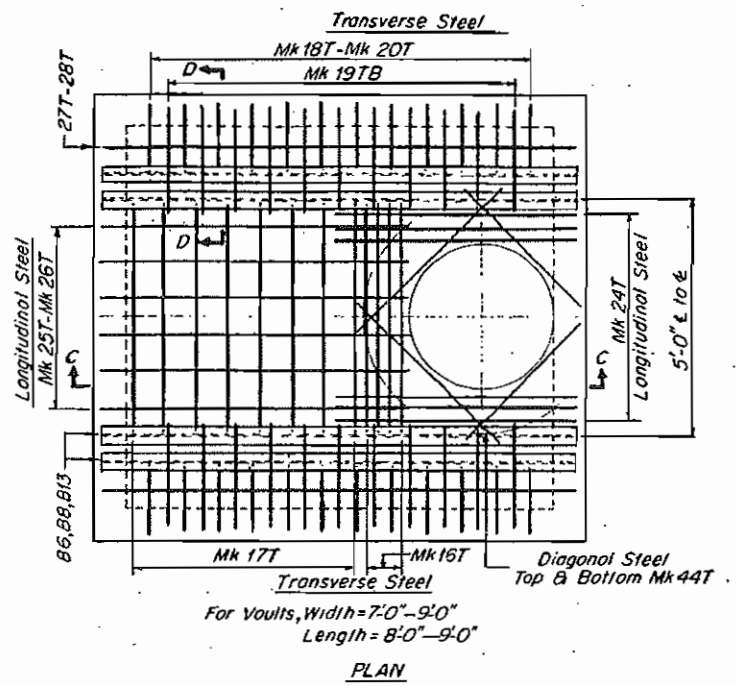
DETAILS OF UNDERGROUND ELECTRIC VAULTS
